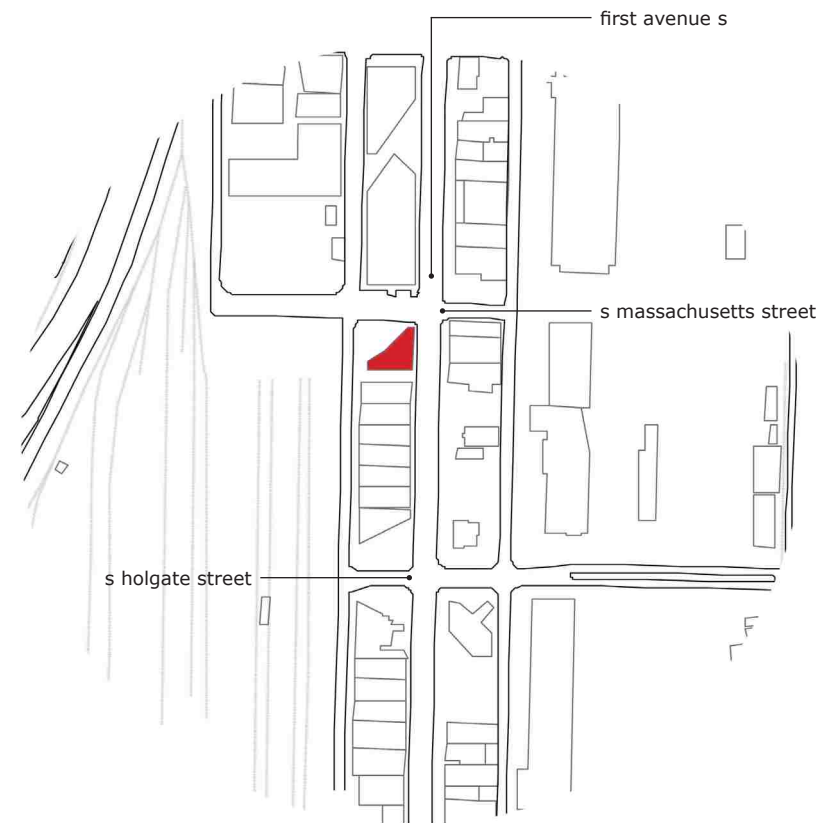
Building reuse site plan; Kellogg's Warehouse shown in red
